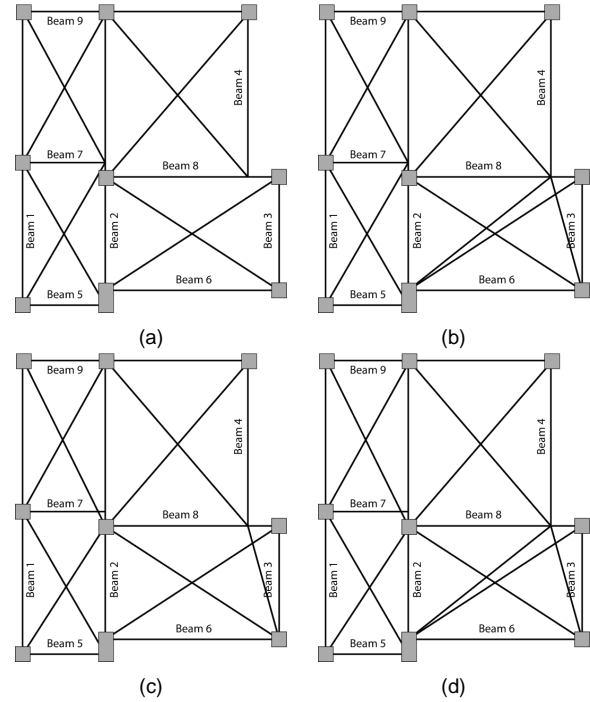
Equivalent slab modelling configurations using truss element to consider axial flexibility of the floor
